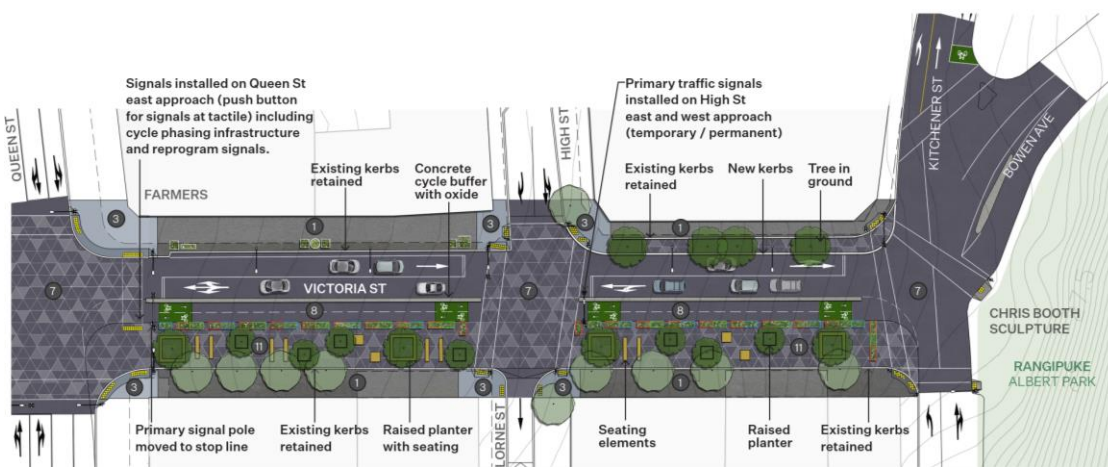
Stage 1 - Queen Street to Kitchener Street
